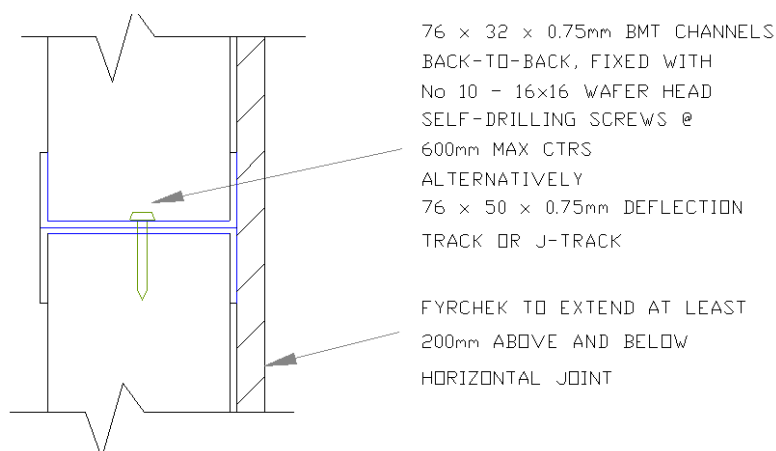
Horizontal joint Type 2 – 75 mm Hebel AAC panel
